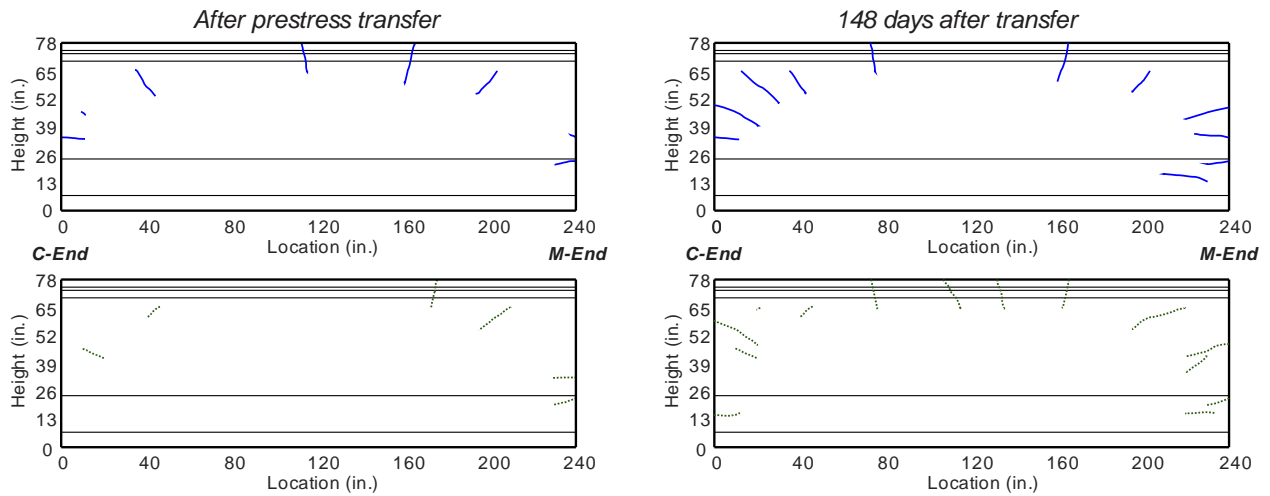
CR-70 before and after transporting to storage crack patterns shown on North face of specimen. Solid blue lines depict cracks visible on the North face and dashed green lines depict cracks visible on the South face.
